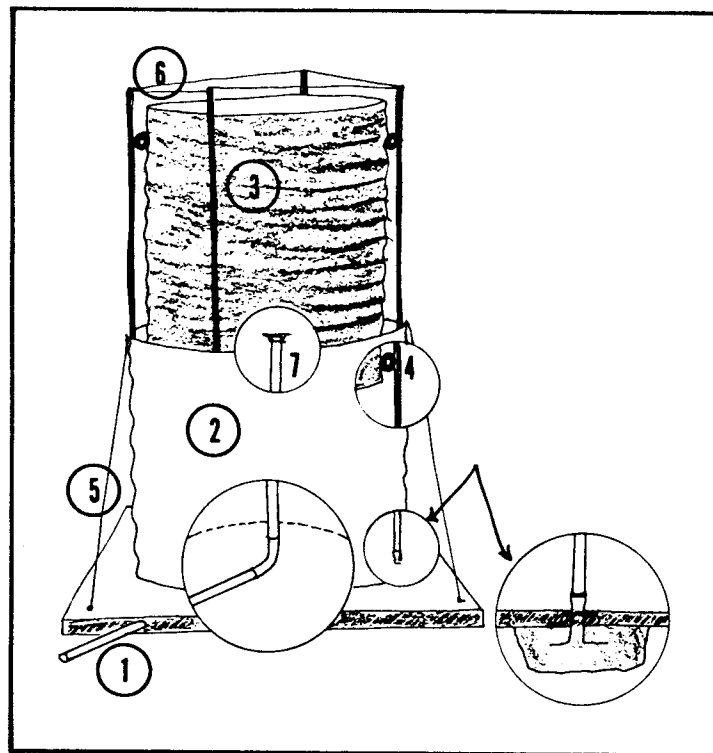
Gas holder. 1) Gas flow in and out. 2) Water tank. 3) Gas holder tank. 4) Roller on guide pipe. 5) Stay wires on guide pipe. 6) Cross bracing. 7) Top of gas pipe with protective plate.
